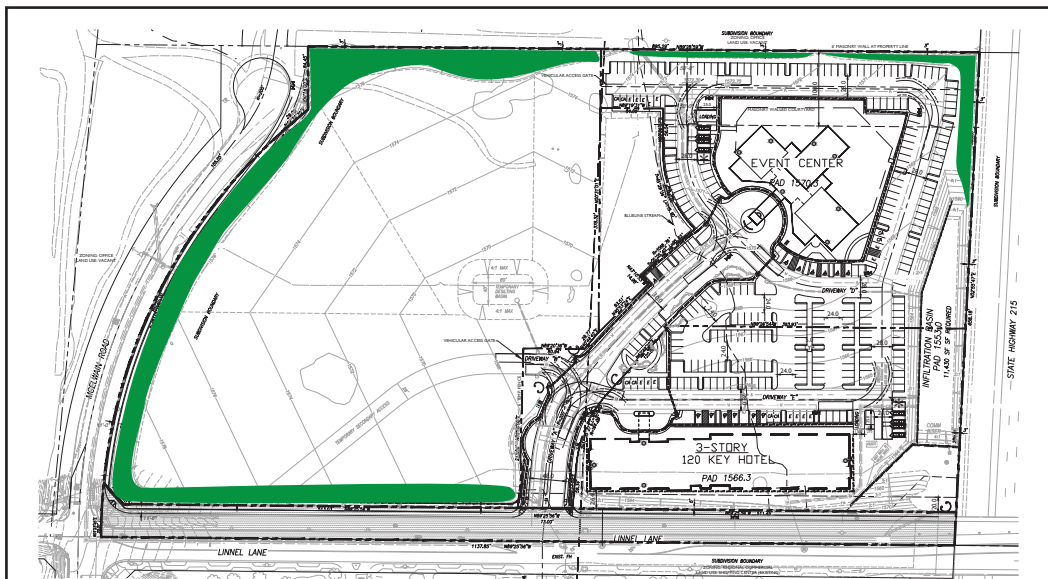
Proposed mitigation planting sites. ■ = potential planting sites.
